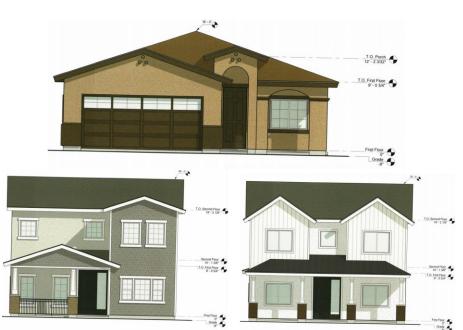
SPANISH COLONIAL REVIVAL, CRAFTSMAN, AND FARMHOUSE ARCHITECTURAL STYLES
